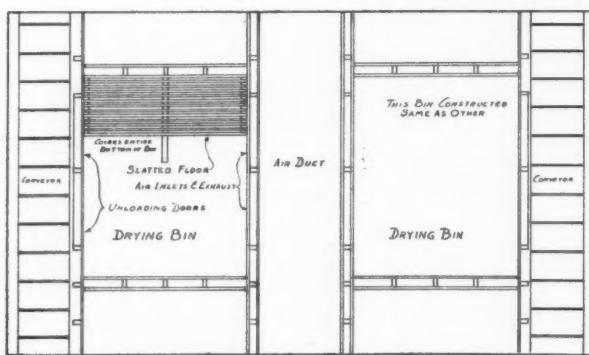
Plan view of two facing bins showing construction of partitions (wall board and tongue-groove flooring on studs) slatted floor (1 by 4's).
